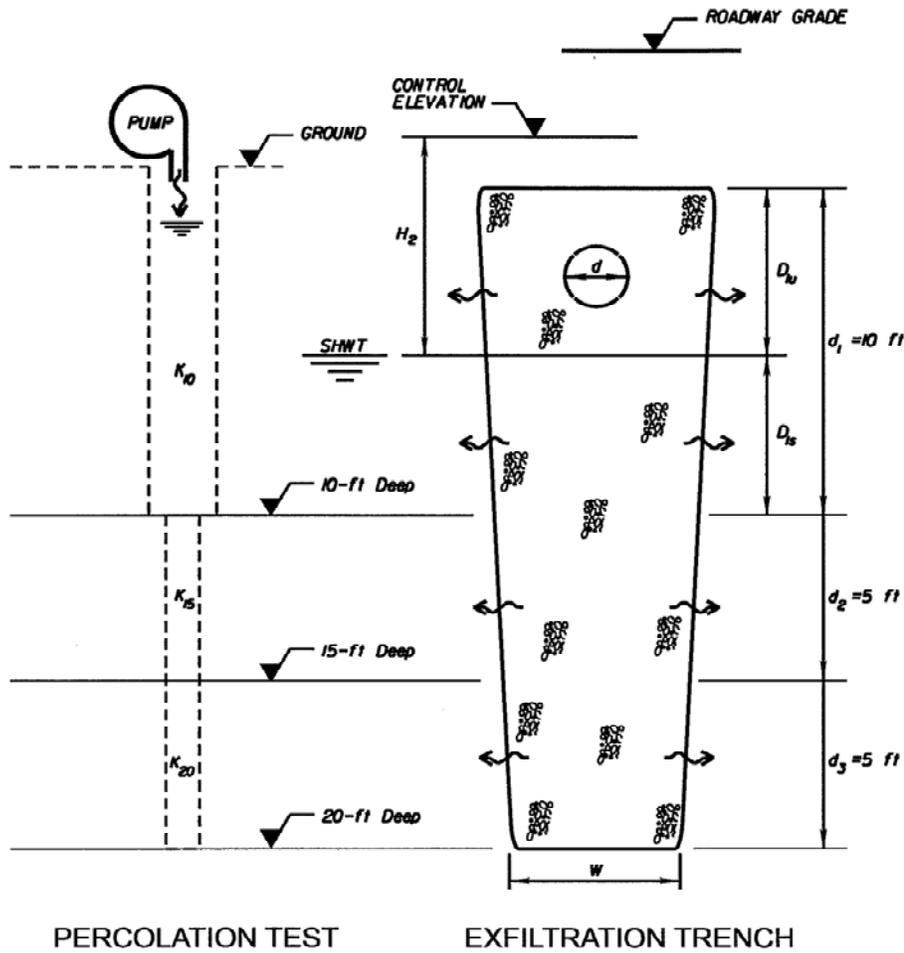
SAMPLE EXFILTRATION TRENCH
